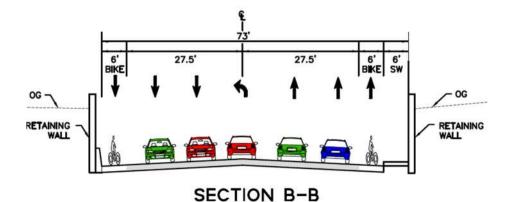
(cont.): Mary Avenue Underpass Tunnel Alternative (Cross-Sections)
